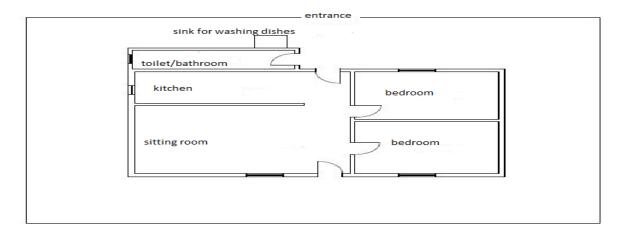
Floor Plan of an Intermediate Housing Unit in L Section
